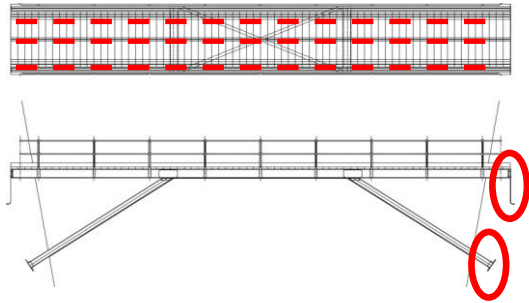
A plan and section of the Bridge identifying the main structural elements, i.e., the three main beams; the anchors; and the abutments.
